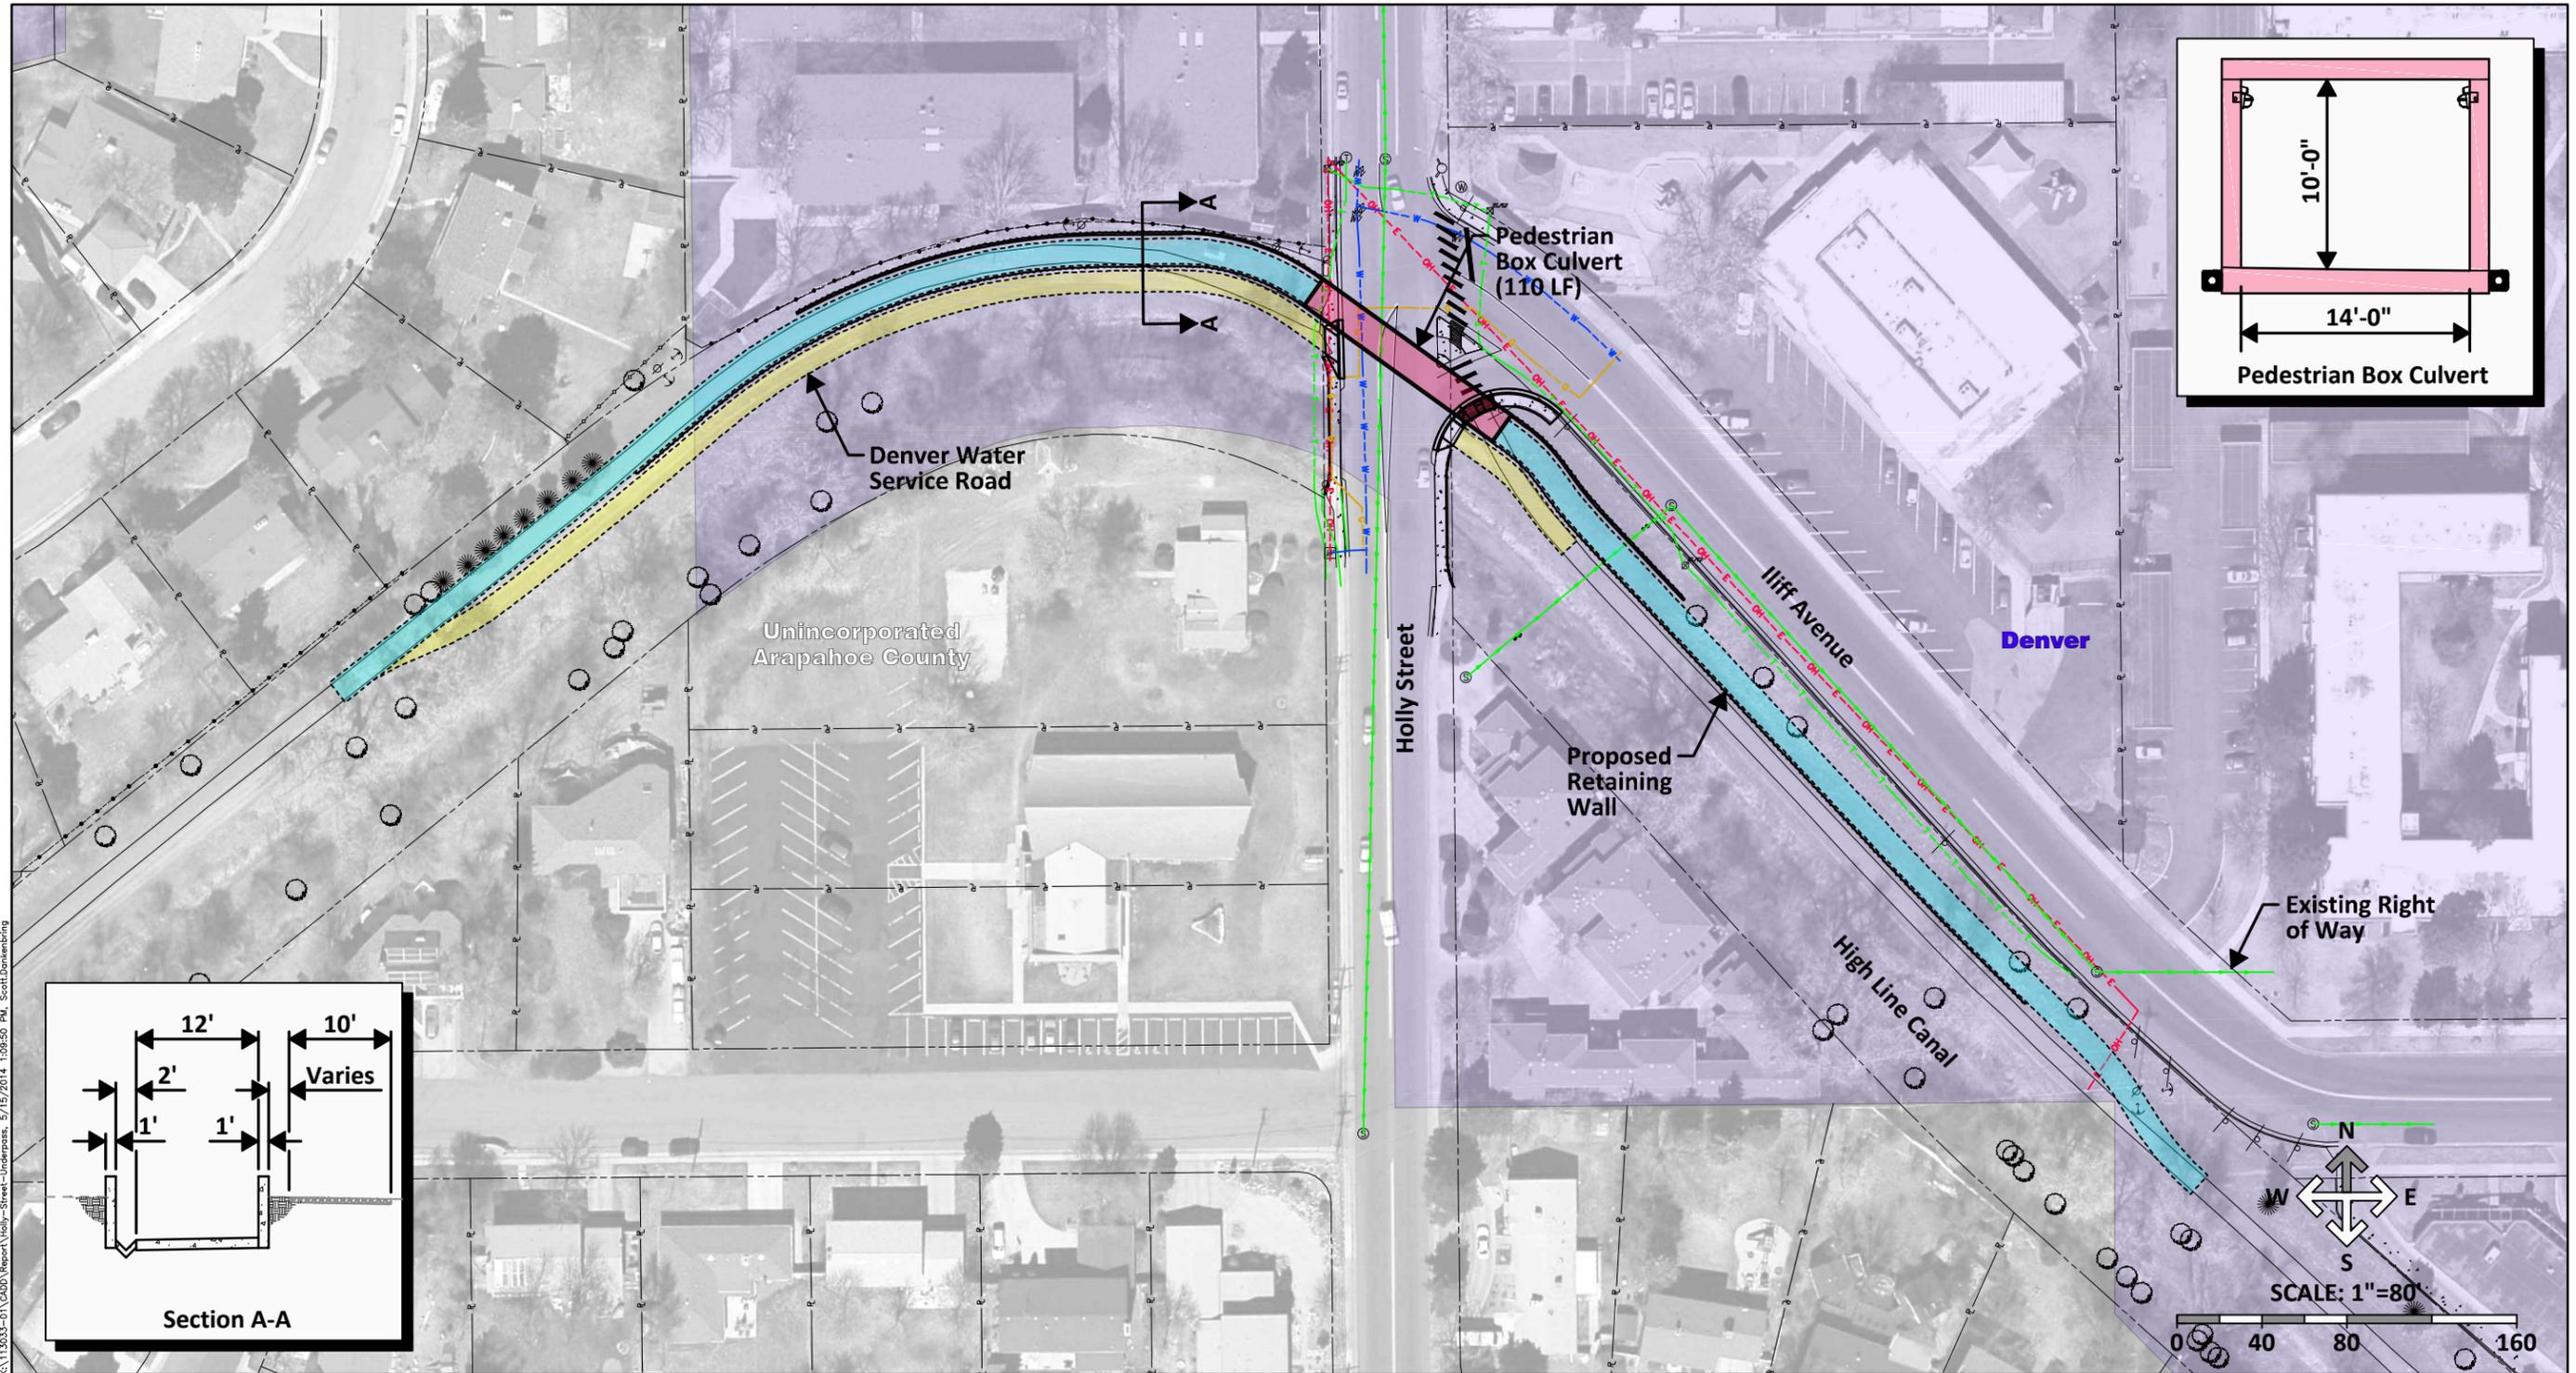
Holly Street at Iliff Avenue Crossing At-Grade Improvements
